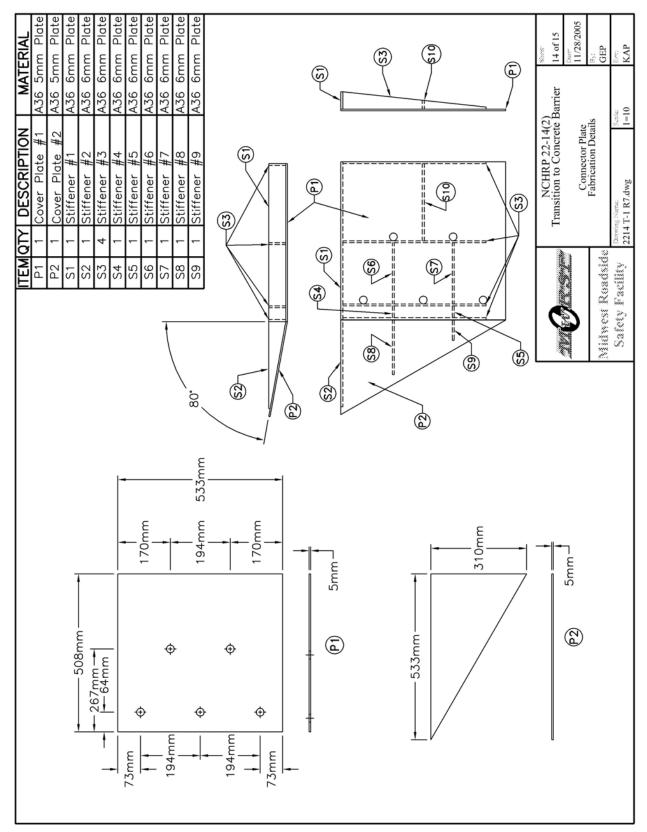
Approach Guardrail Transition to Concrete Barrier Design - Connector Plate Details
